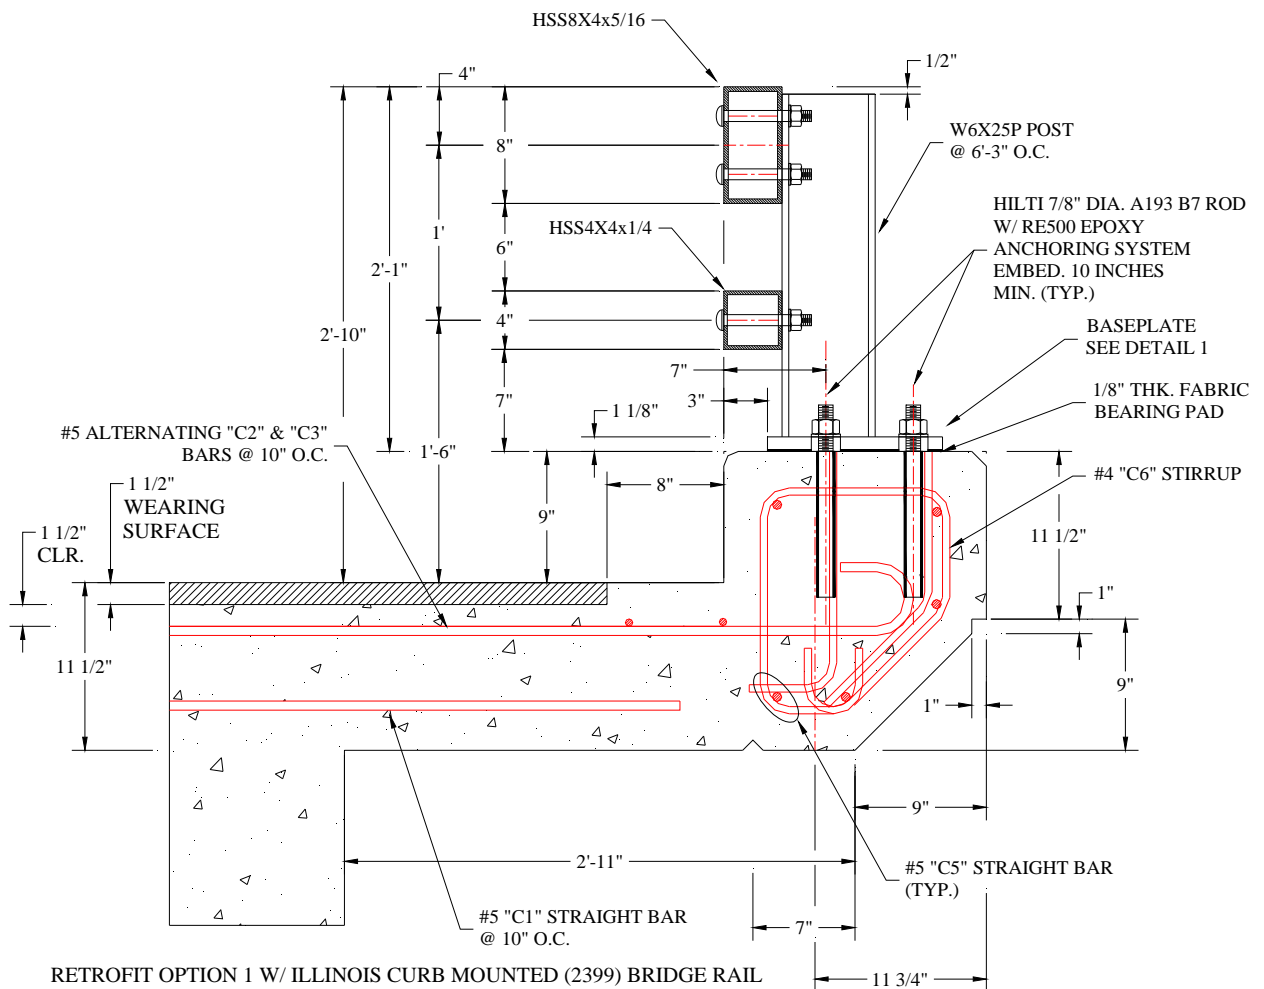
Cross Section of Illinois 2399-1 Bridge Railing Retrofit Design
